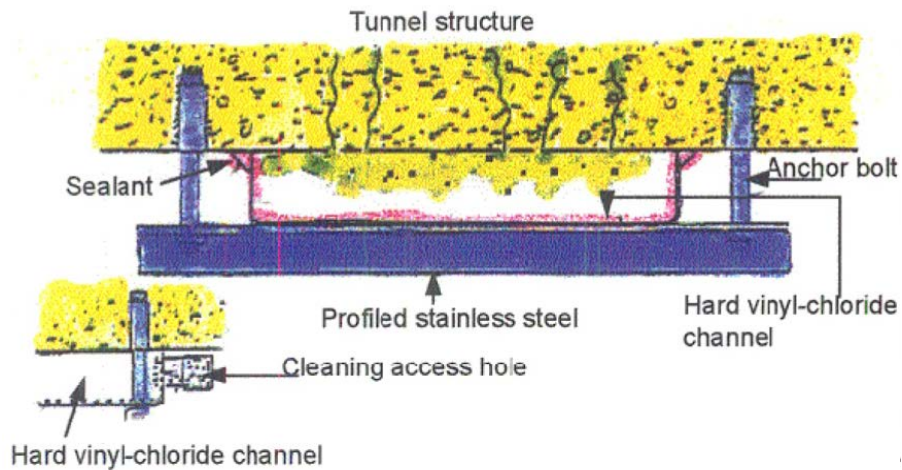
Hard vinyl-chloride channel supported by profiled stainless steel and anchored to concrete roof for conveying leakage (Russell, 2001).
